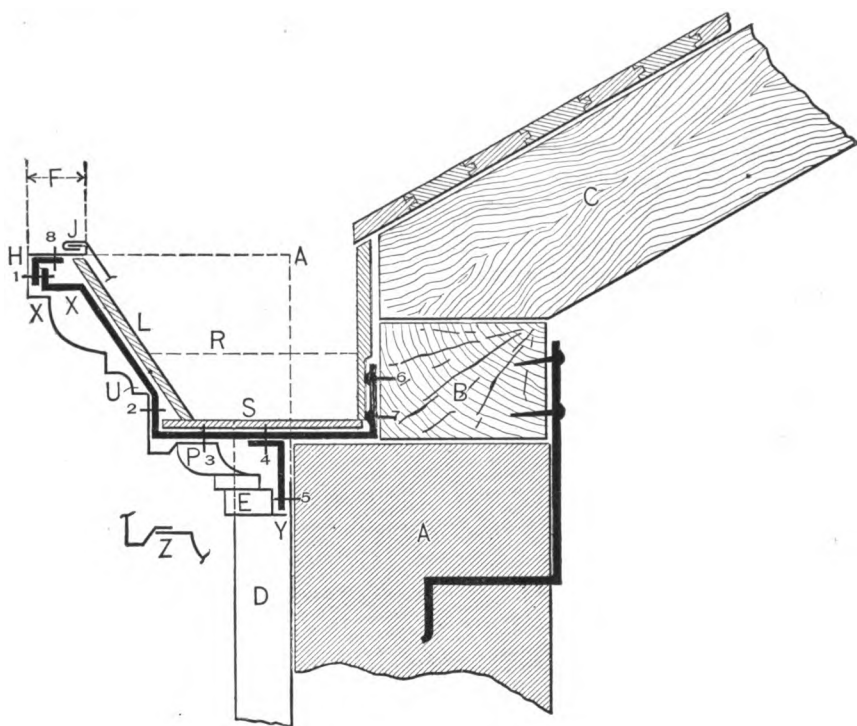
Fastening Sheet Metal Molding Against Wooden Plate.
